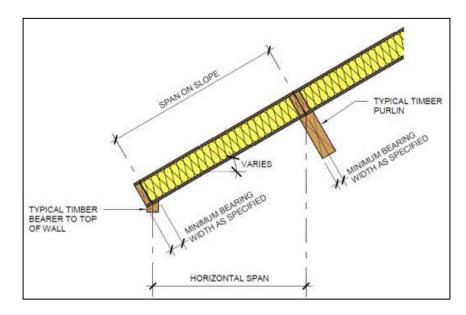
Indicative Section Detail for Roofs in Table 15 to Table 17
